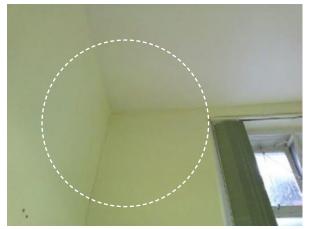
Photograph showing area at junction between roof, north wall and Office 2 partition wall
